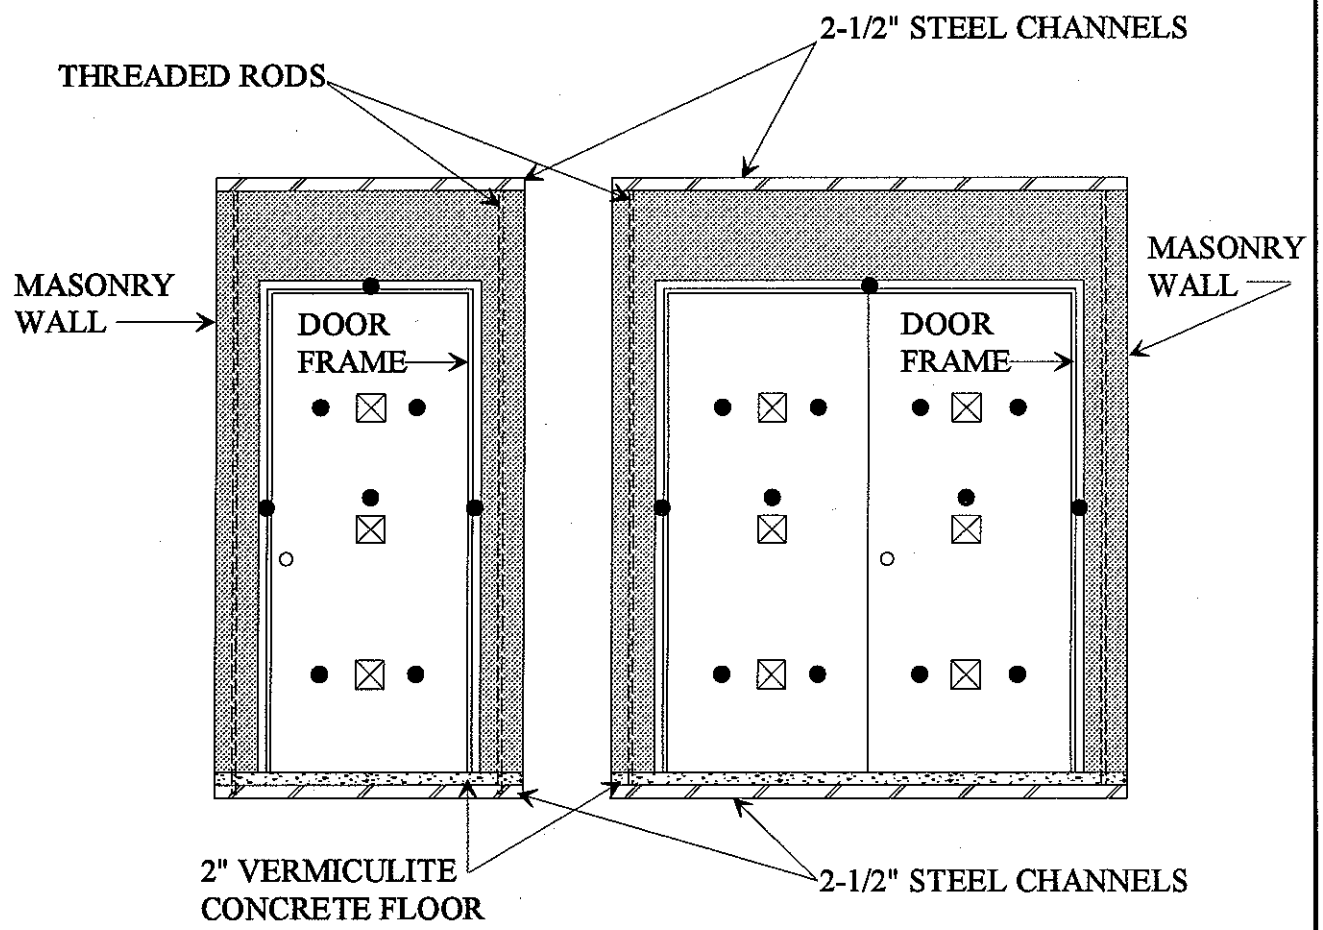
FIRE TEST ROOM (FRONT ELEVATION)
